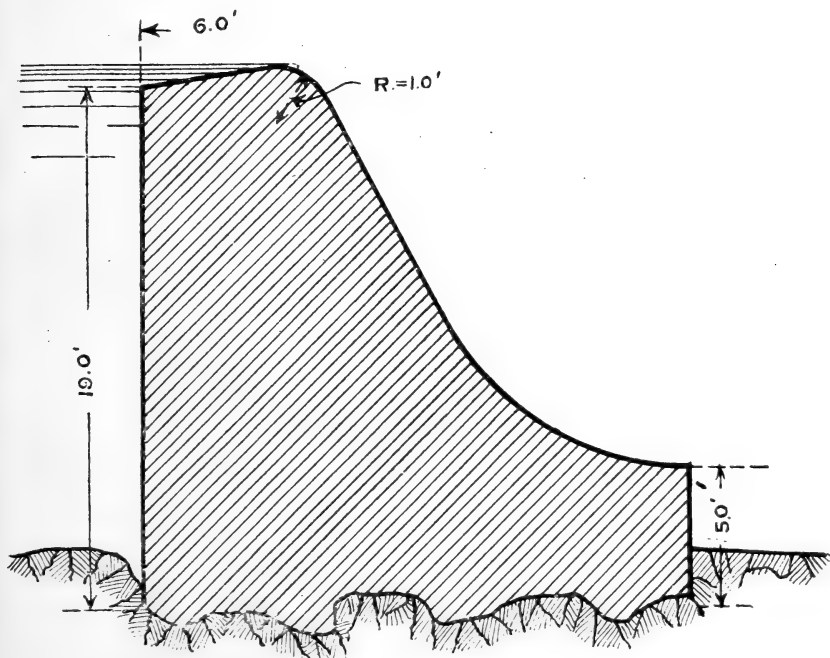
Section of dam on East Canada creek at Dolgeville.
